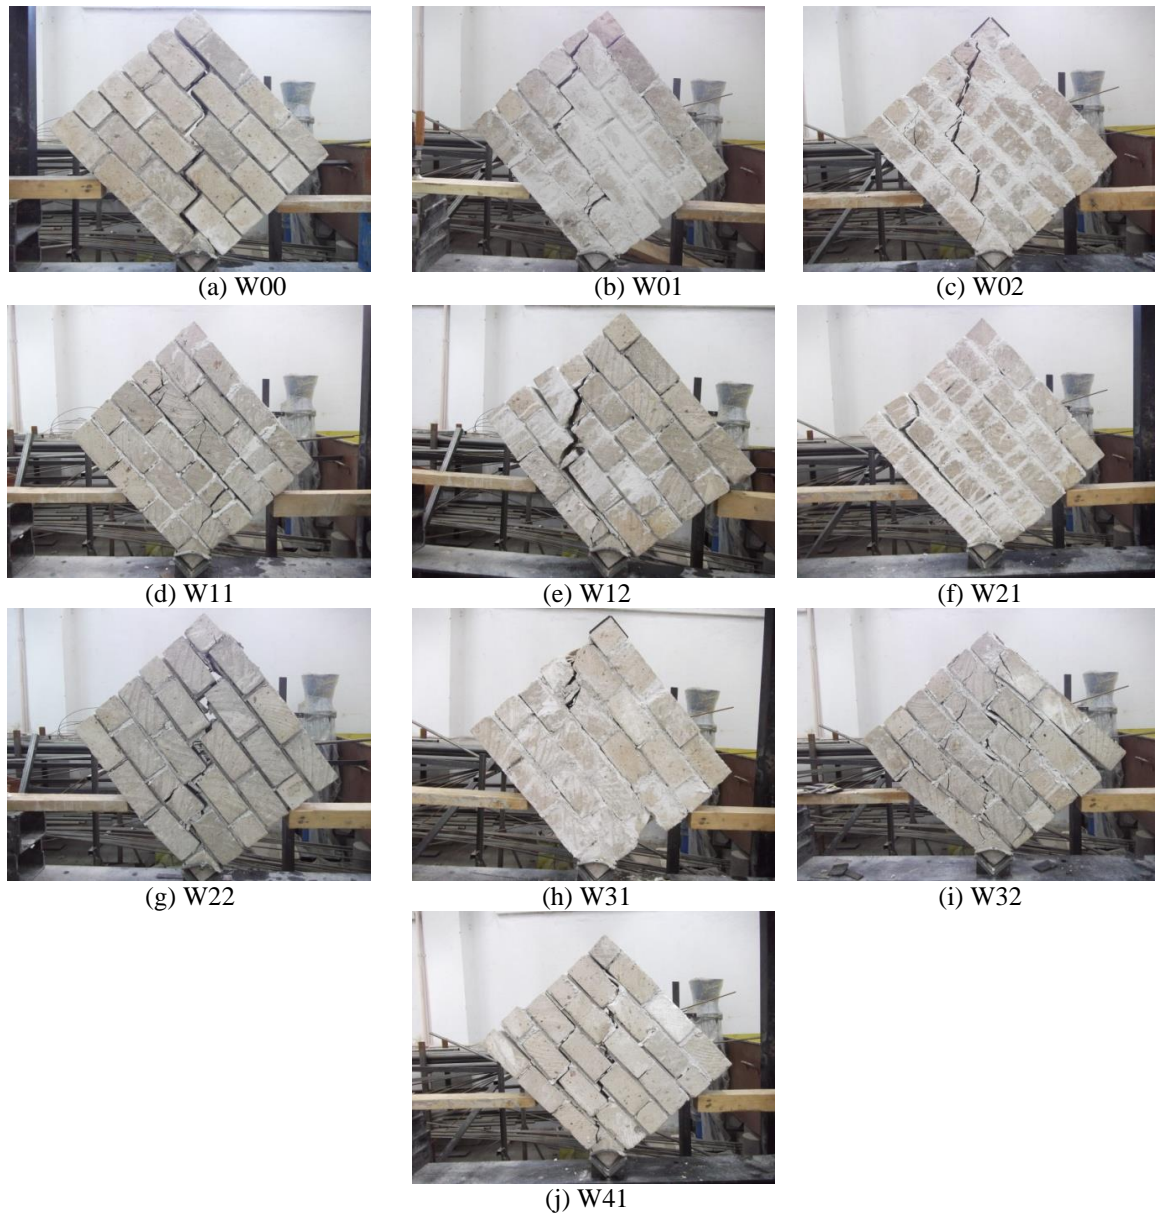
The failure pattern of masonry specimens in diagonal compression
